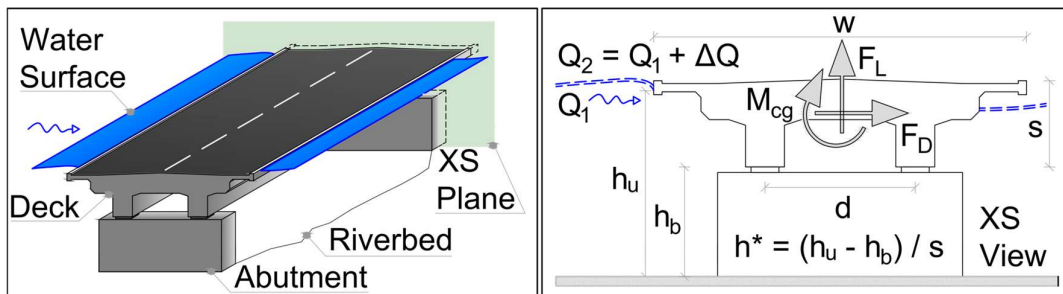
Bridge Deck elements (left) and forces schematics in a cross-section (XS) view (right). For representation purposes, river embankments, wing walls and approach ramps of the bridge are omitted. These elements are intended to be adjacent to the bridge abutments. Inundation Ratio indicated as h^* . Q_1, Q_2 represent water discharges, h_u and h_b symbolise the water and the deck elevation, respectively. Deck thickness is indicated as s , width as w and the bearing distance as d .
